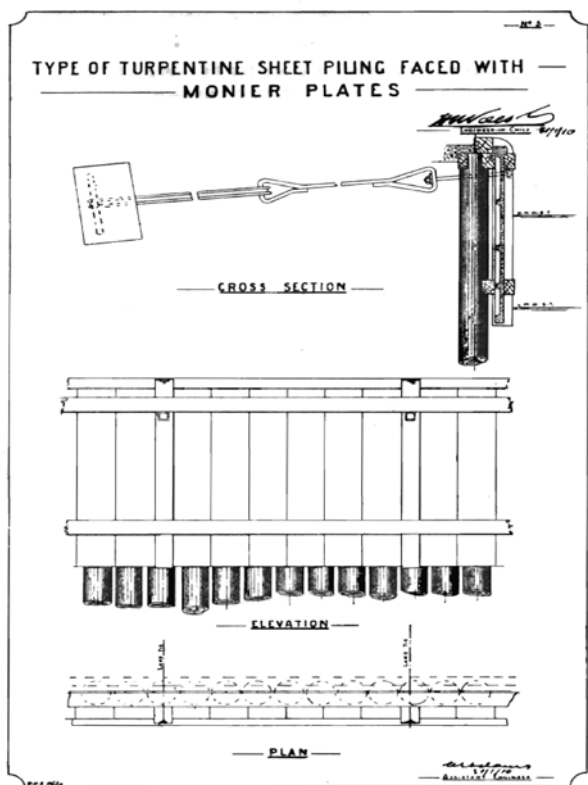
Design of timber sheet piling seawall faced with Monier concrete plates.³⁹
